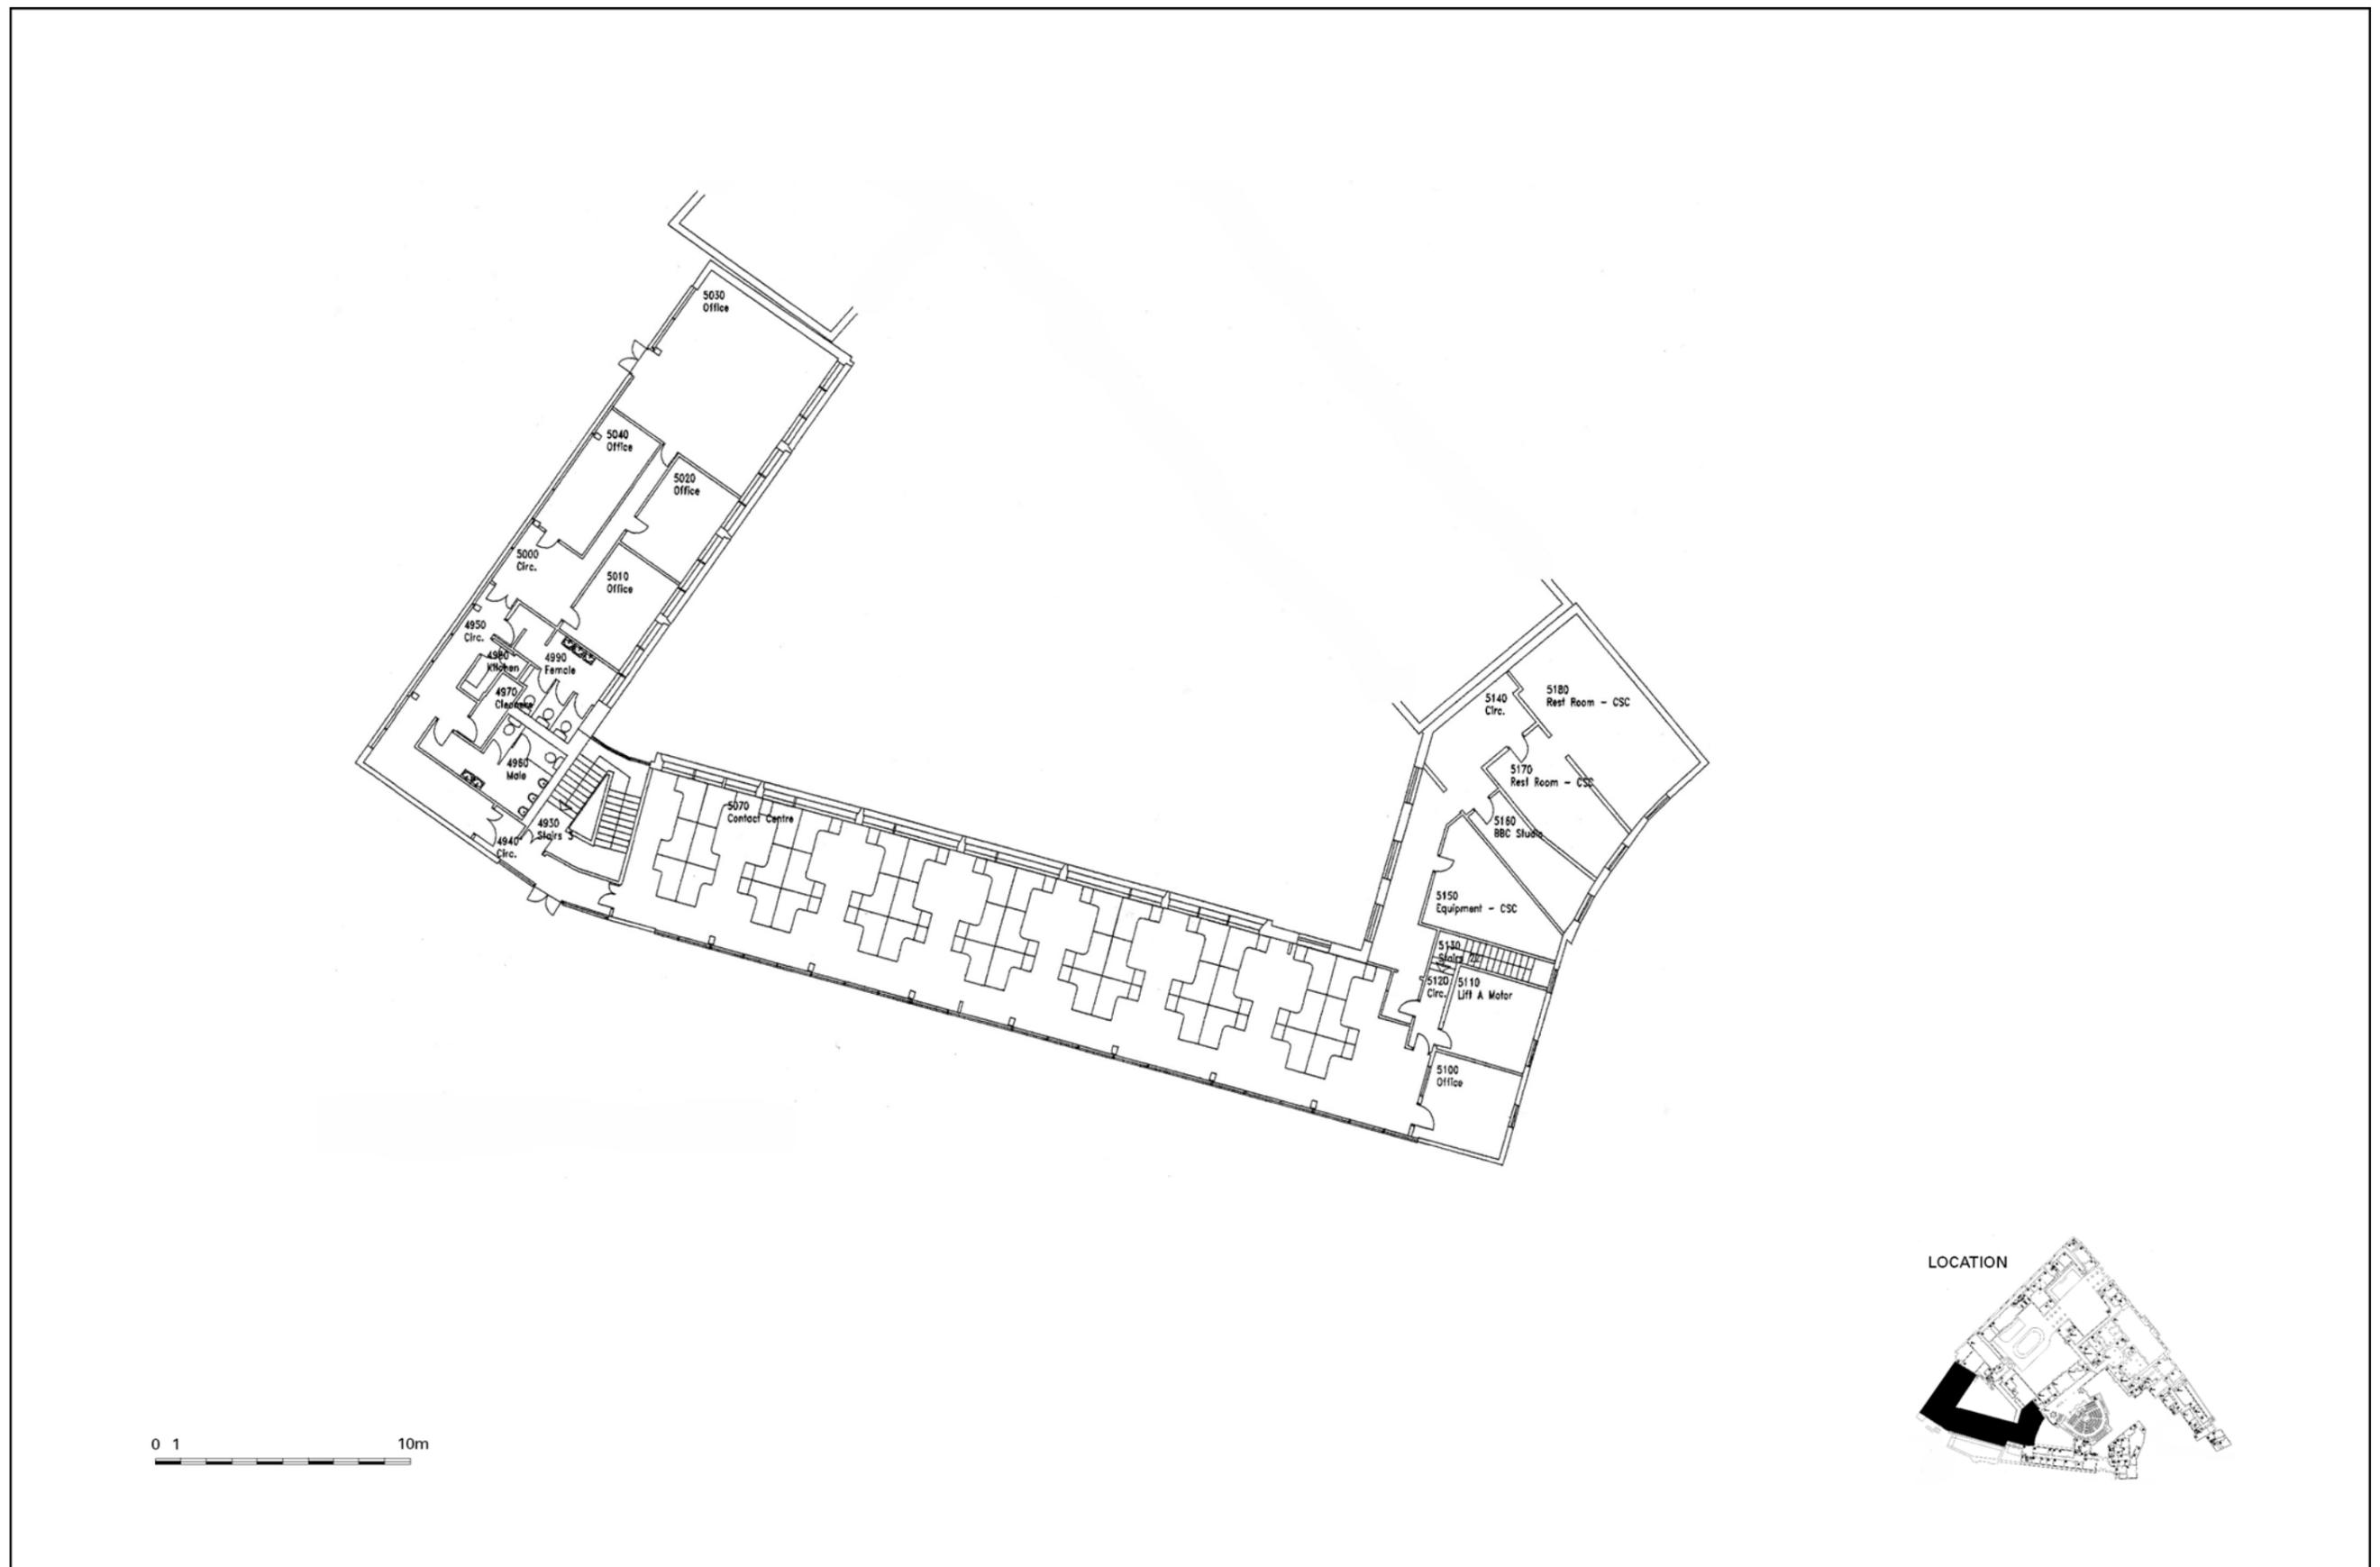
1966 Committee Rooms, Ante-chamber and Offices, third floor plan
